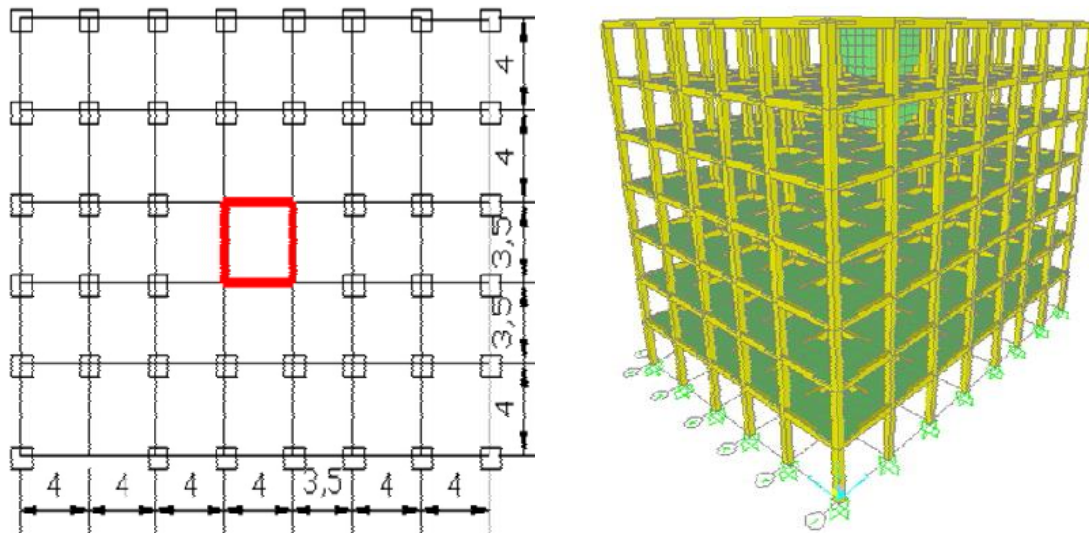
PLAN AND 3D VIEW WITH SHEAR WALL AT CORE
